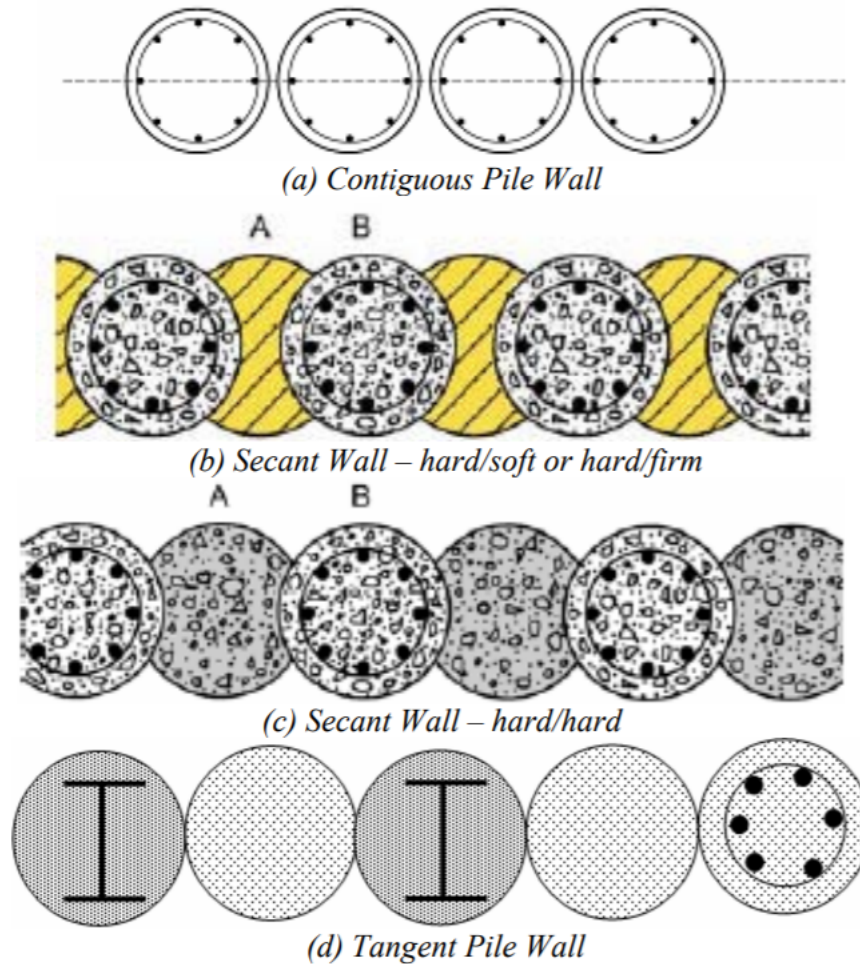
Types of pile walls (Godavarthi et al., 2011)
